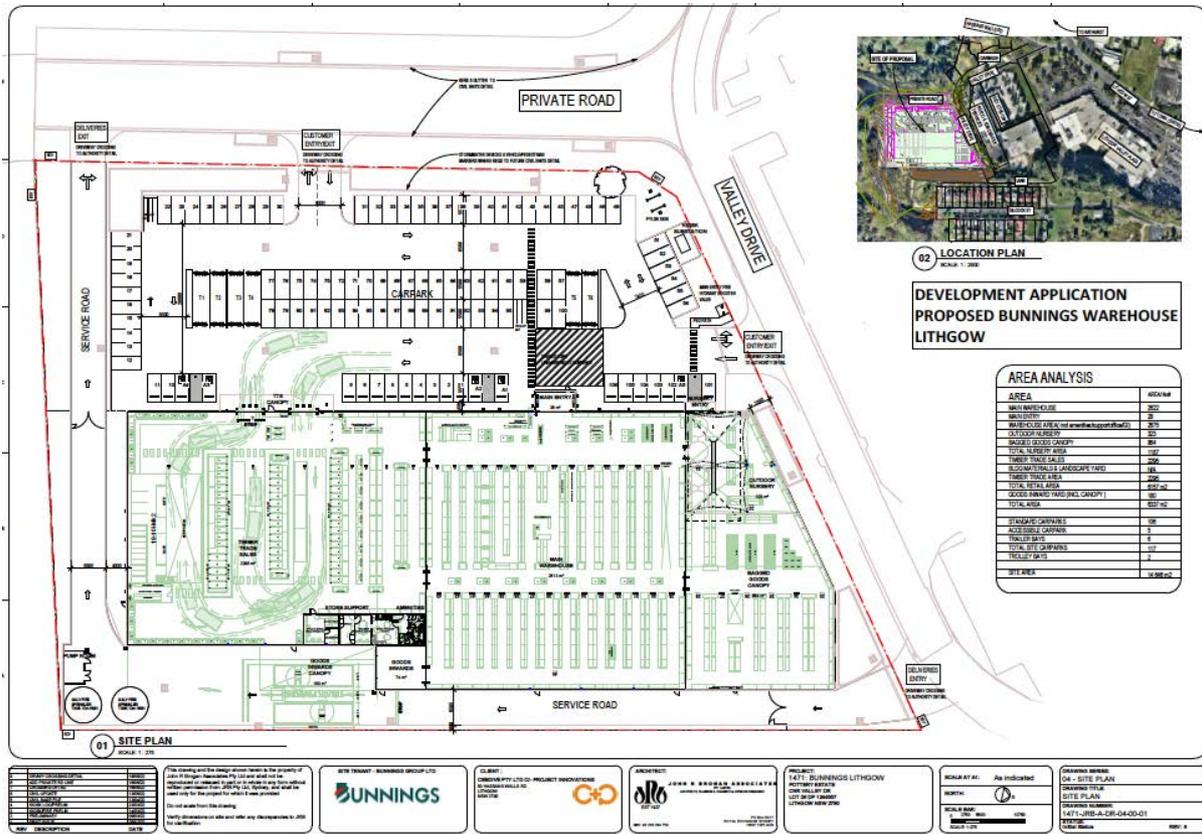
Plan of the proposed development. (John R Brogan & Associates Site Plan 1471-JBR-A-DR-04-00-01)
